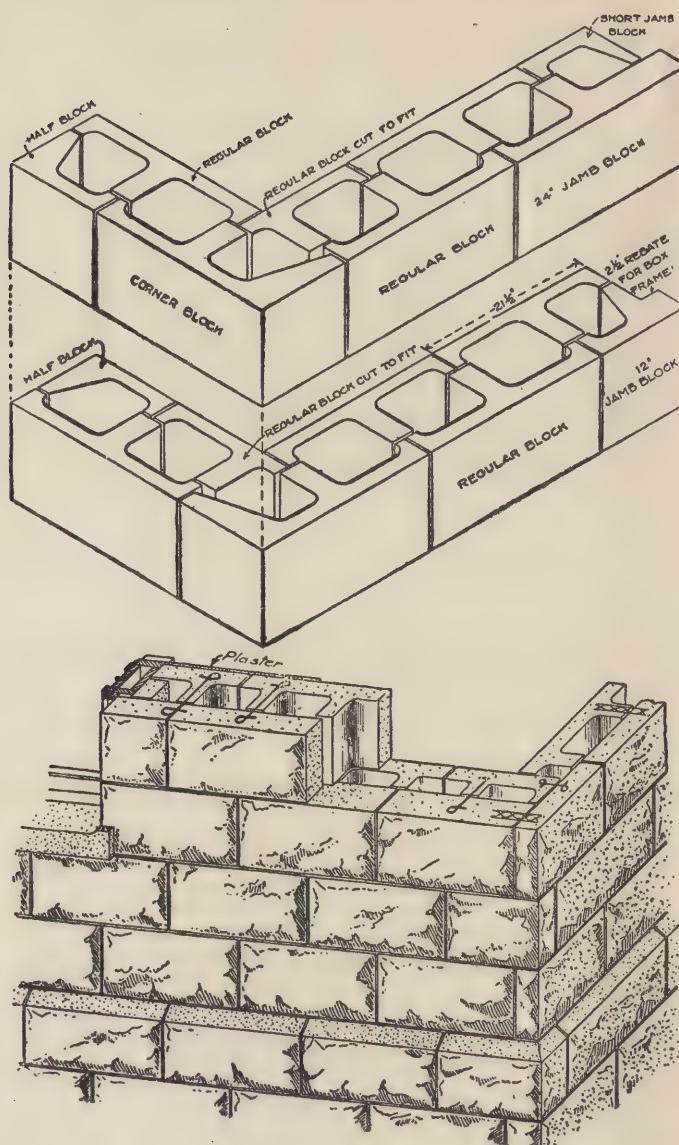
Two Methods of Hollow-Wall Concrete Block Construction.
